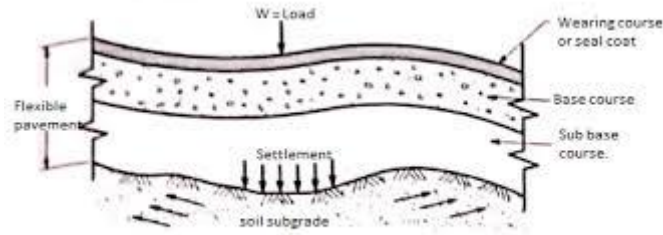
Subgrade failure of flexible pavement.
